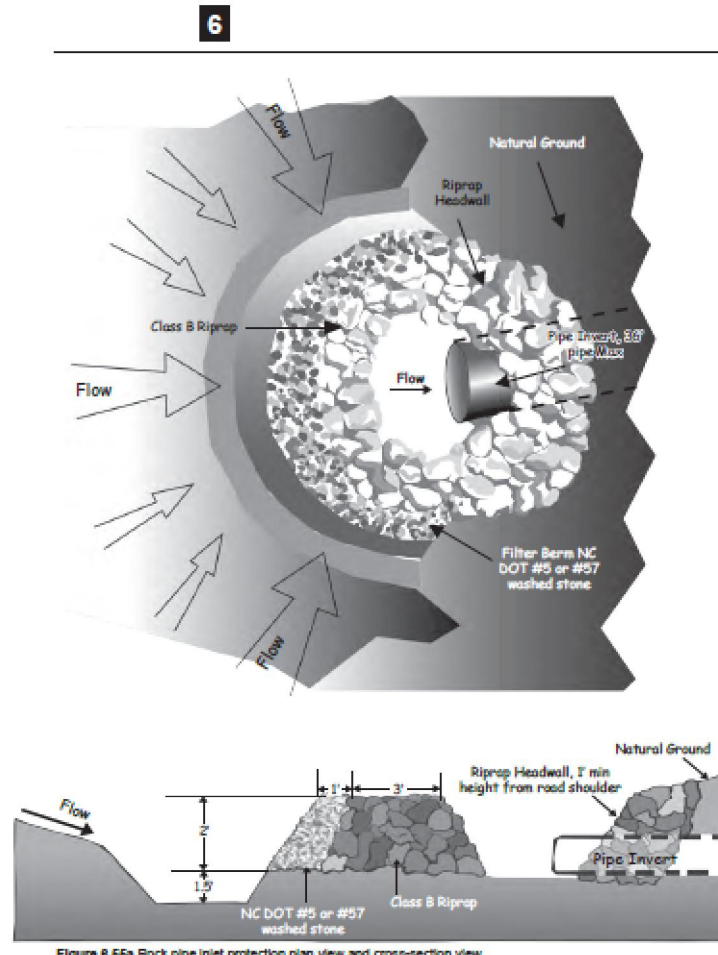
Rock pipe inlet protection plan view and cross-section view
